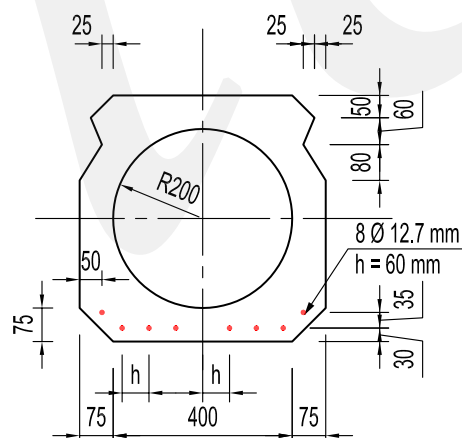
Cross-section dimensions of precast concrete girder. Note:  $h$  = strand spacing. Dimensions are in centimeters unless otherwise indicated. 1 cm = 0.3937 in.; 1 mm = 0.0394 in.
